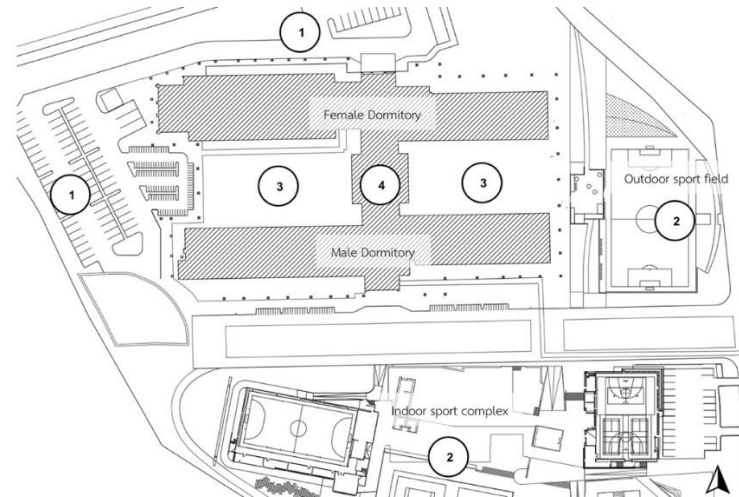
Master plan of the Bangkhuntien Campus dormitory and surrounding facilities: 1) Outdoor parking area; 2) Sports complex; 3) Outdoor courtyard; and 4) Single-sex dormitories – Male (South Hall) and Female (North Hall) (Drawn by second-year Interior Architecture students for INA242 class of 2/2020)
